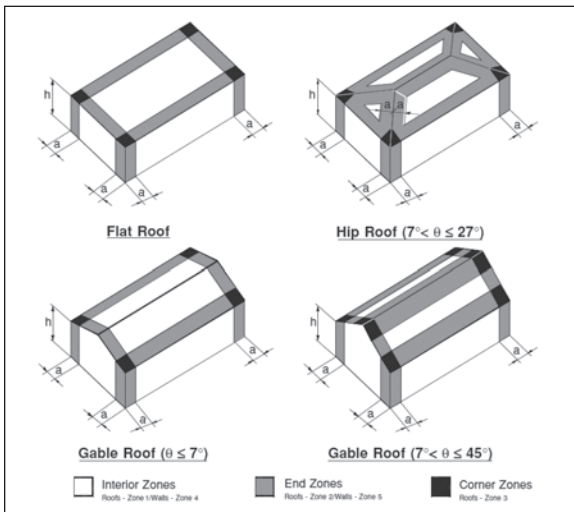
C — Roof Zones – Interior, Edge, Corner
